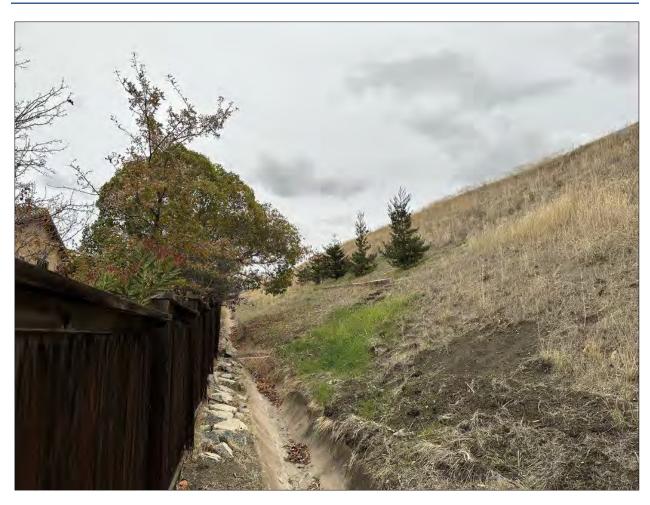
Photo S – Resident has planted trees and built a short keystone-type retaining wall uphill from the V-ditch. Note soil erosion from the disturbed slope sloughing into the ditch.
